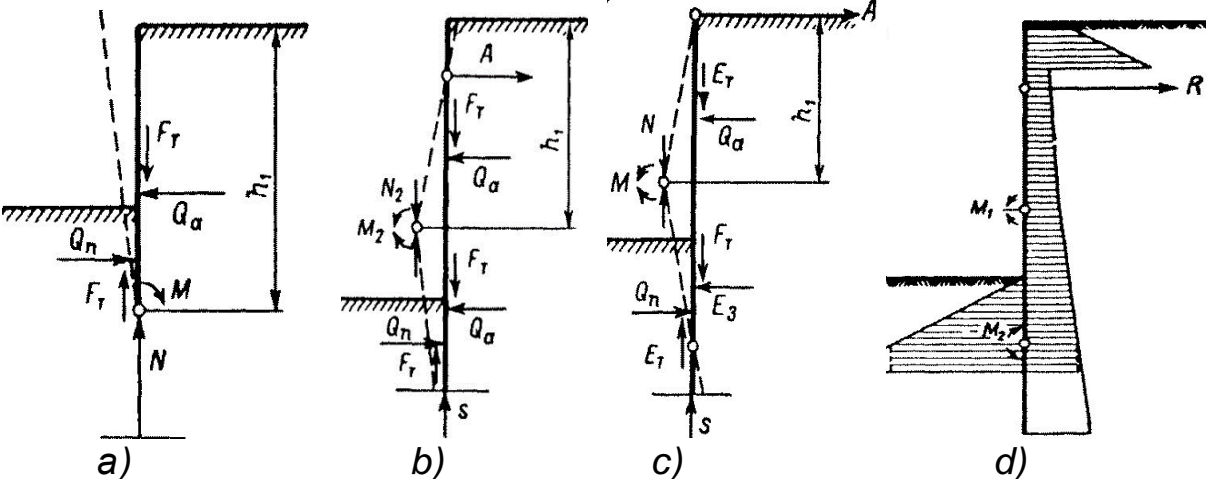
Graphical interpretation of the loading process on the wall according to Hansen’s theory: a, b, c – kinematic scheme of the sequence of the creation of plastic hinges; d – diagram of the loading of the soil to the wall under presence of vertical distributed loading (before creation of plastic hinge).
